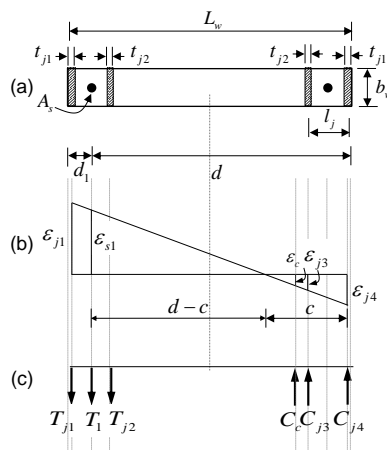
Internal forces of concrete and reinforcing bars at lower PC wall panel
